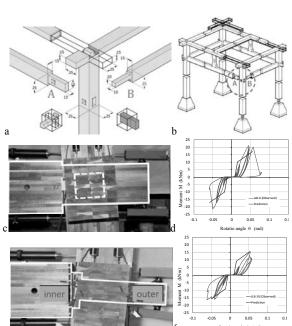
b. Joglo joint construction; b. Core structure of Joglo; c and d. Joint detail type A and it's curve deformation; e and f. Joint detail type B and it's curve deformation.
